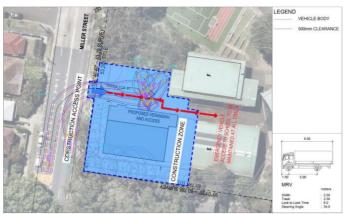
Swept path for a SRV turning in and out of the site (Source: Crossley Transport Planning)
